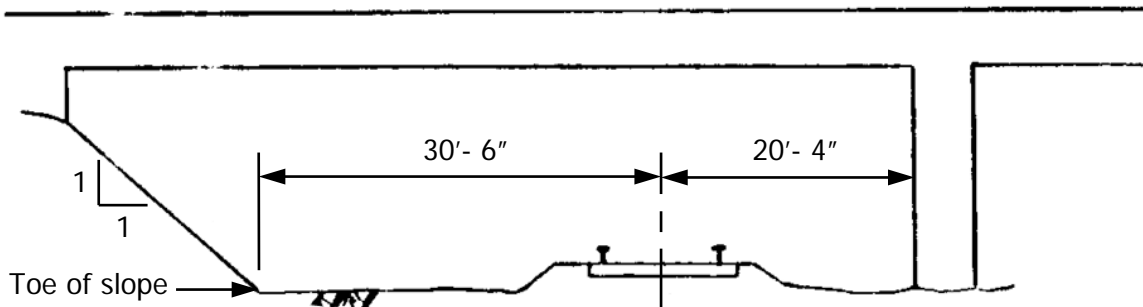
Bridge elevation view with one passenger rail and one freight rail track below the bridge.
